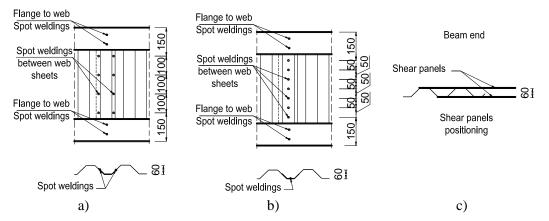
a) Connection between corrugated sheets of beam CWB SW-1, b) Connection between corrugated sheets of beam CWB SW-2, c) position of the shear panels.
